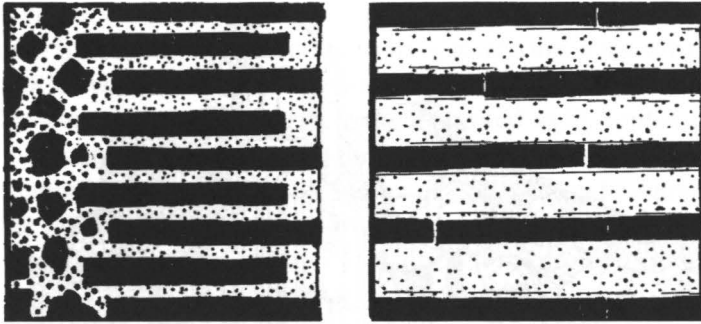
Diagram showing section and facade view of a wall constructed in the recessed brick-technique
